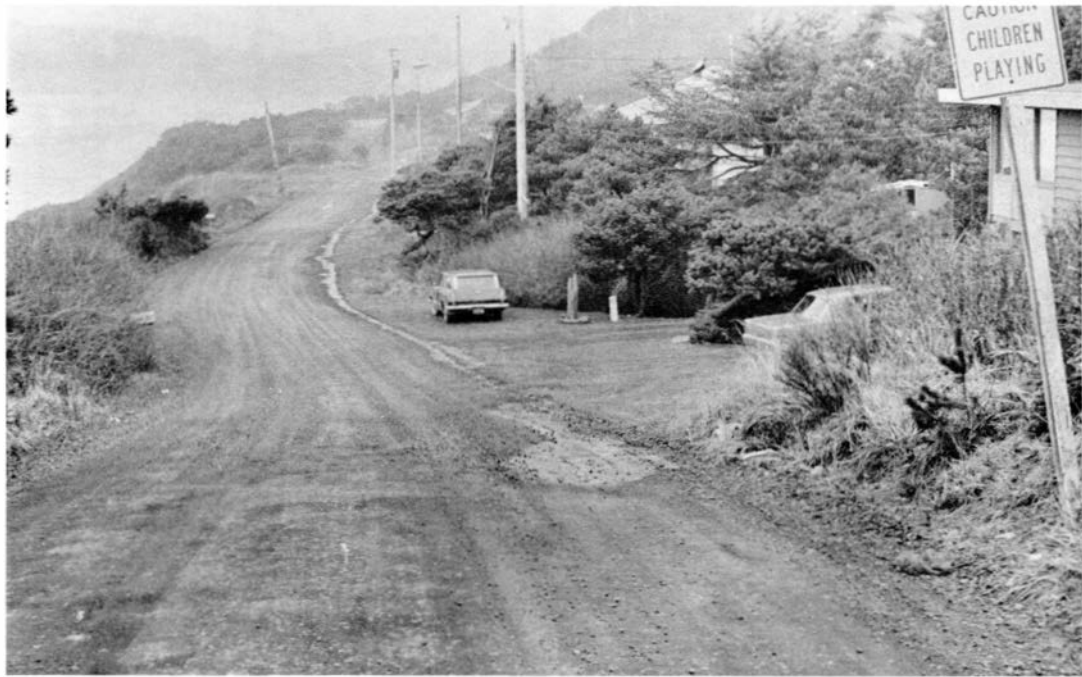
Spring Street dislocated by landslide movement. Water flowing down right side of street comes from spring, indicating the disturbed subsurface drainage of the landslide mass.
